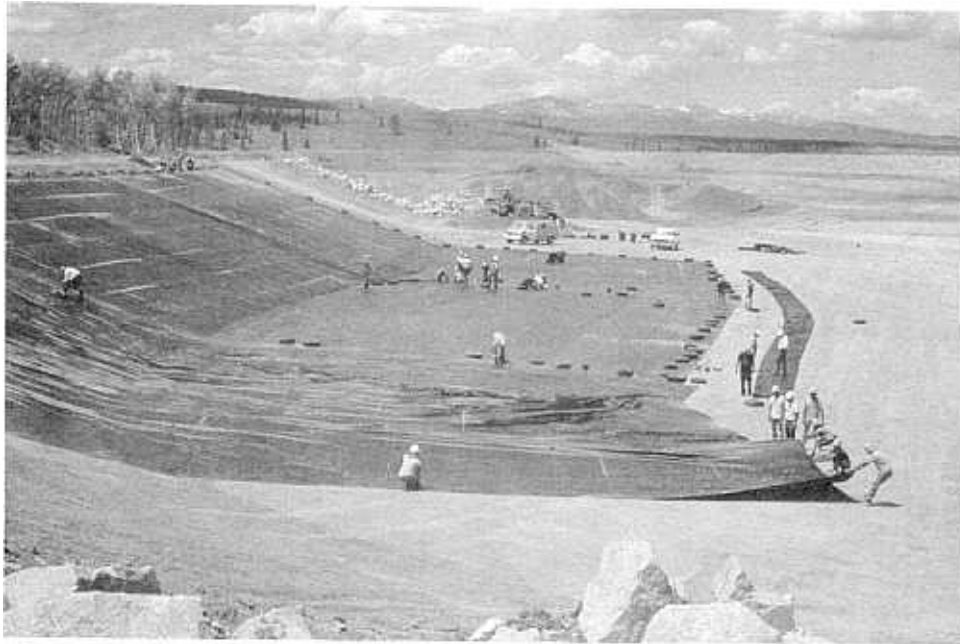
Installation of the reservoir membrane lining on the side slopes. Note tires used to hold down lining against wind. Photo P-801-D-79740
